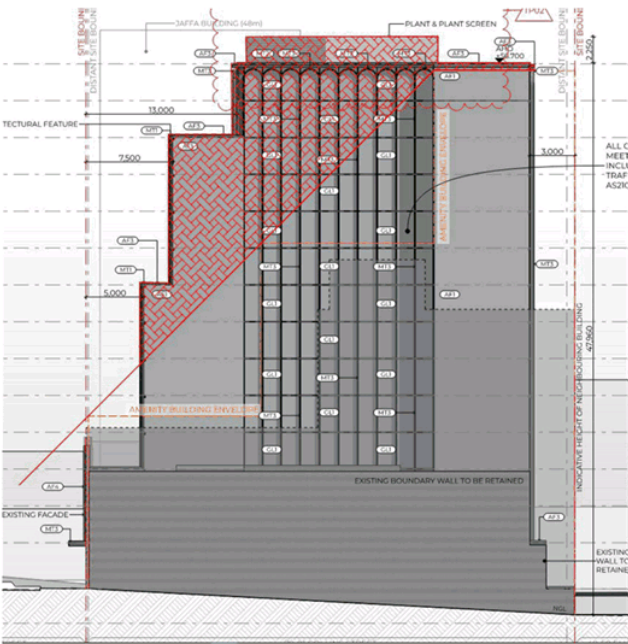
The north-eastern elevation of the proposed development, with that part beyond the amenity building envelope hatched in red.
